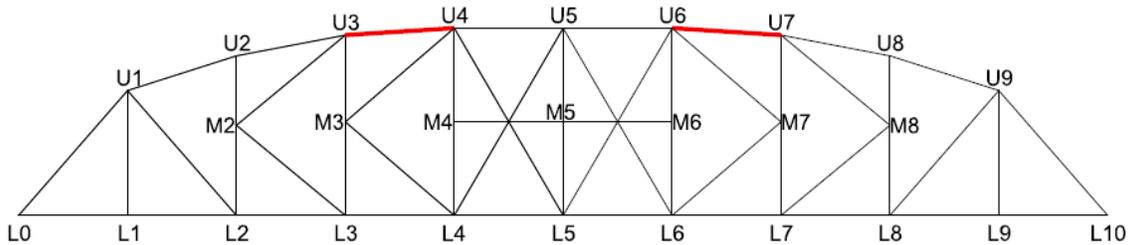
Overstressed Truss Members (Span 3) – Rehabilitation with Widening
